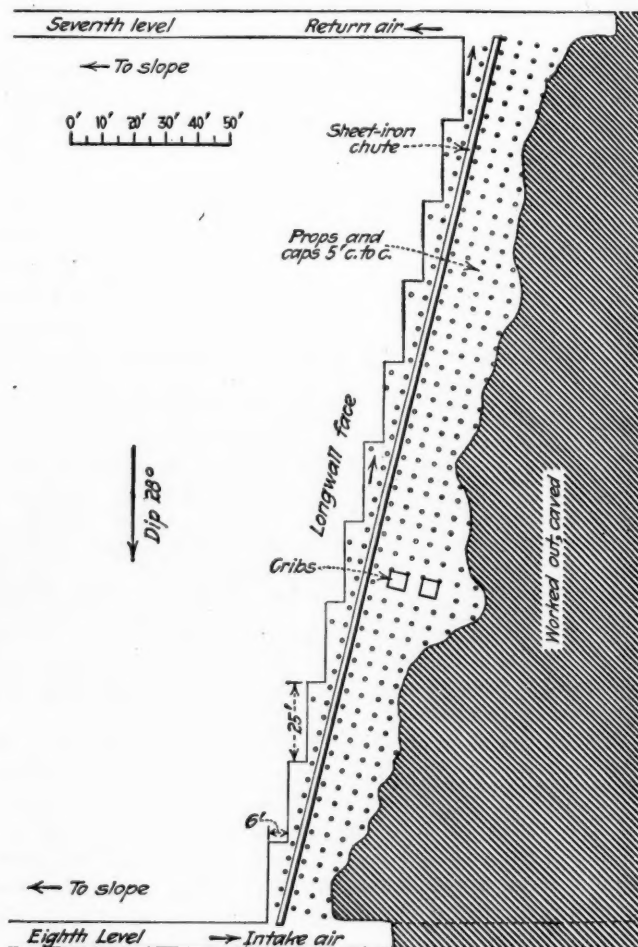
PLAN OF LONGWALL FACE IN OPERATION
